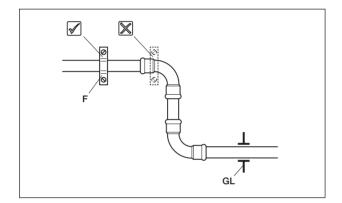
Positioning anchor points: On the pipe, not on the pressfitting
